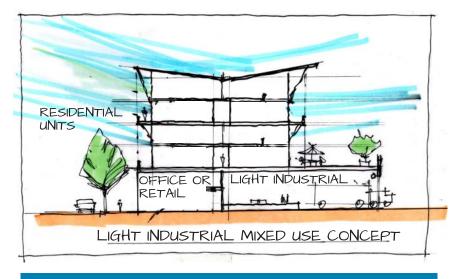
Example of a light industrial and residential mixed use building, showing how residential units might be set back from the loading areas.
